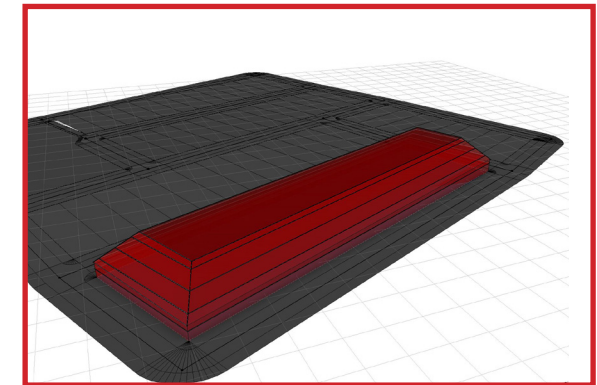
The building envelope returns from the set building height at the street at an angle of 45%.
